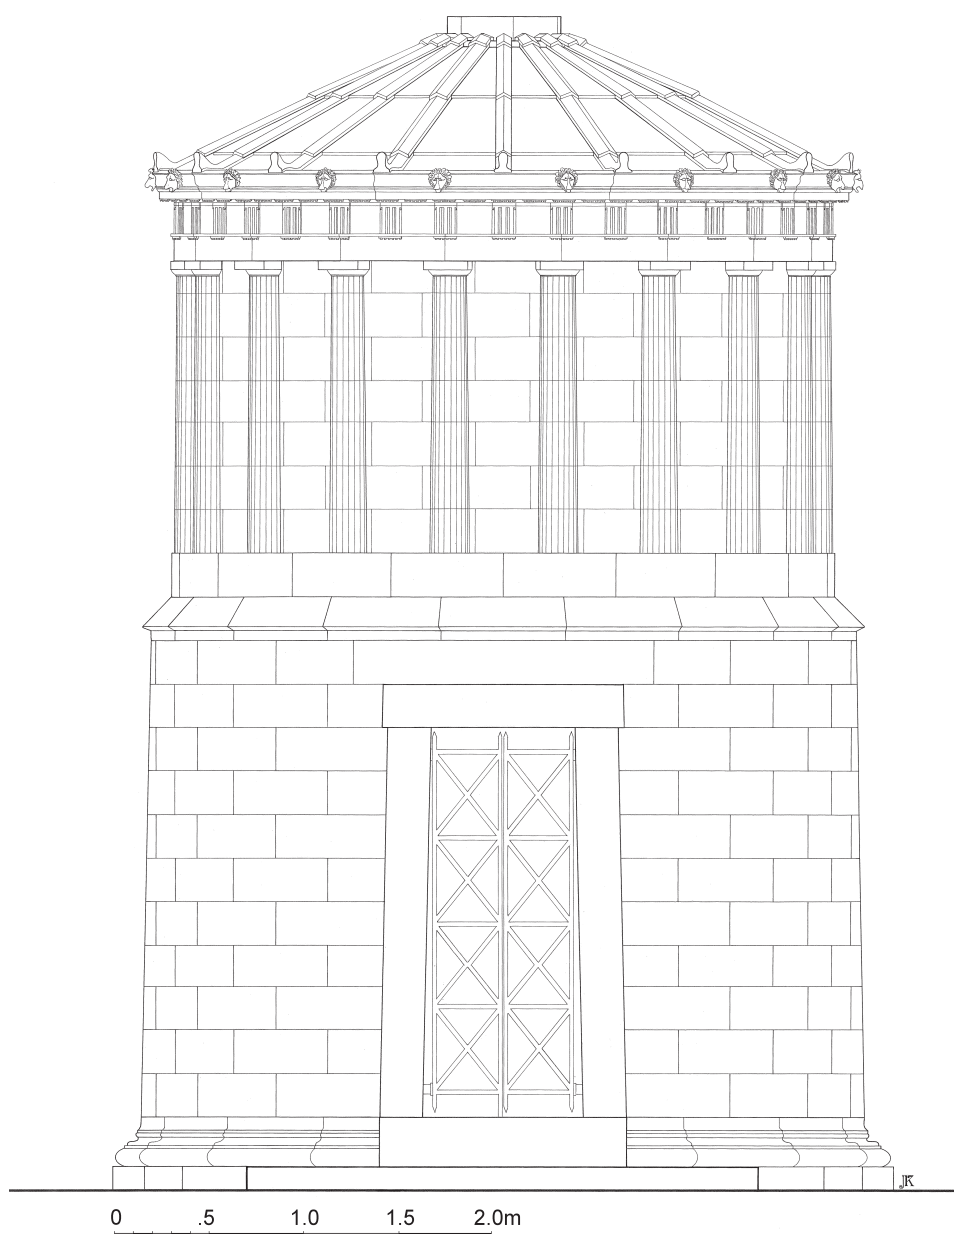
Restored elevation of the Doric Rotunda. Drawing John Kurtich.
